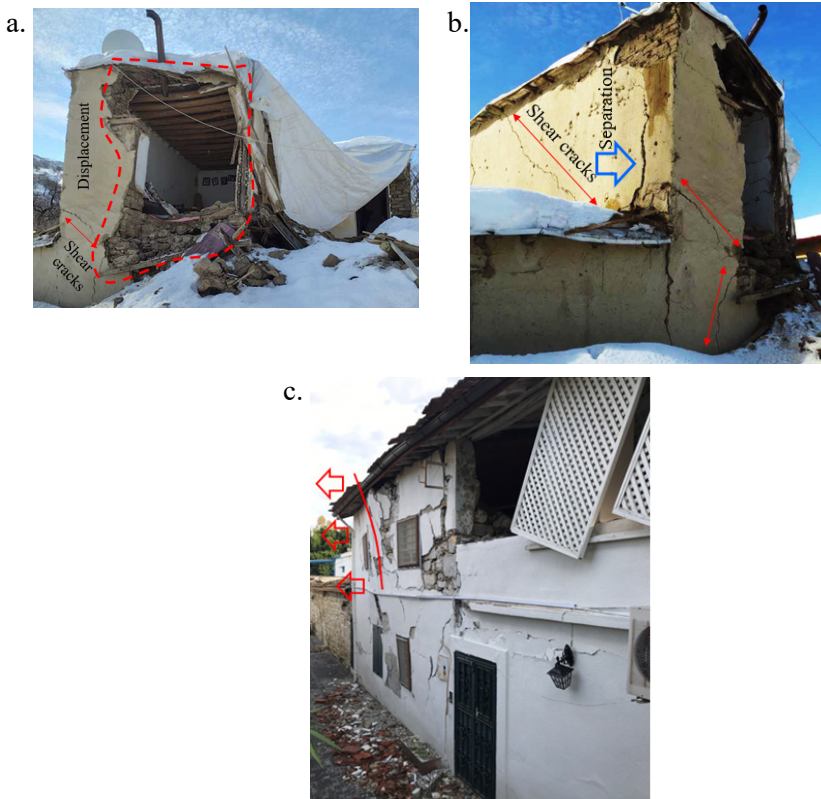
a. Partial wall collapse due to out-of-plane failure and in-plane shear cracks b. Shear cracks on the transverse wall c. Tilting and bulging of masonry wall due to out-of-plane behaviour
